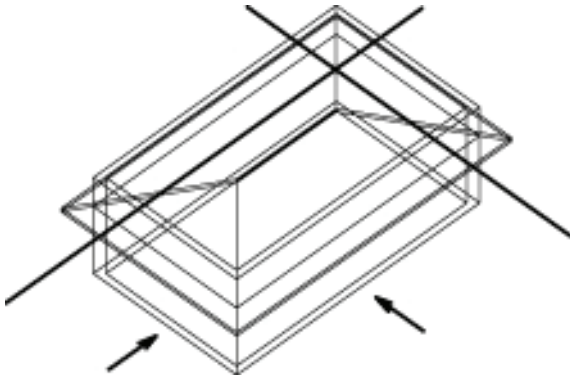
Cut 3D Object - Cut Walls to Roof Line - II
